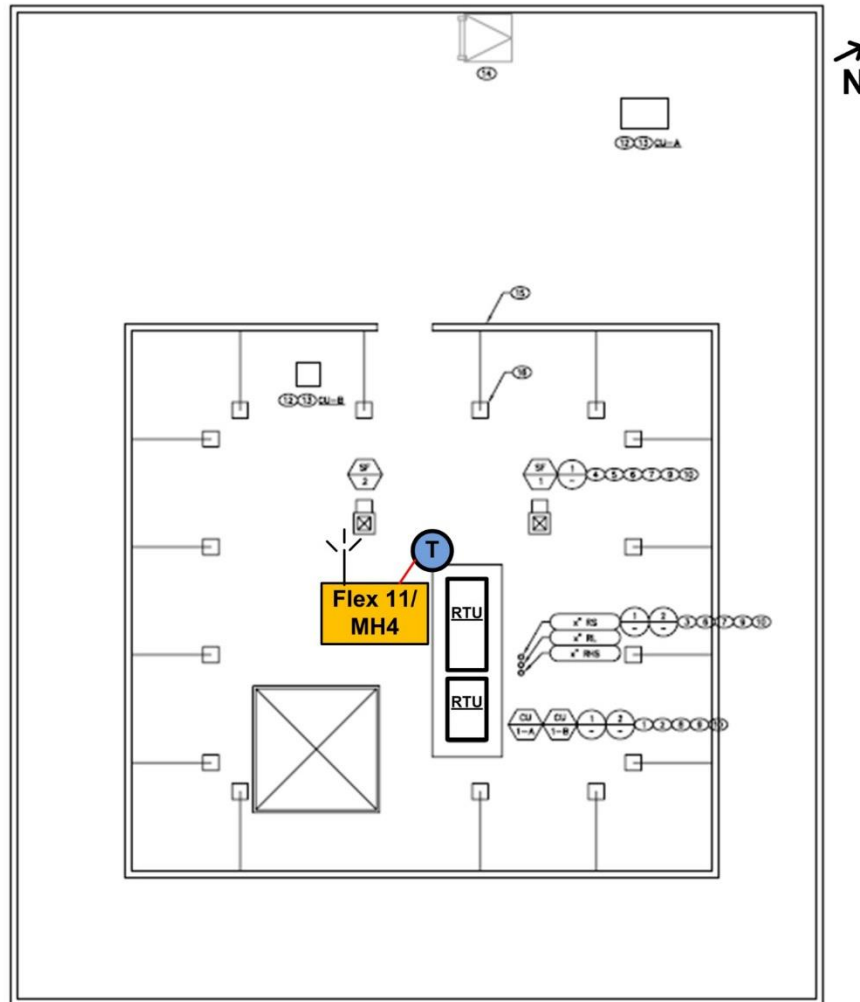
ROOFTOP INSTRUMENTATION PLAN
